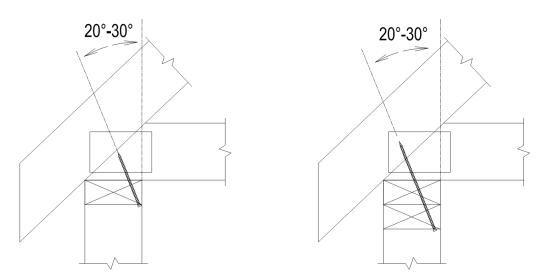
Installation of Fasteners at an Angle in Single and Double Top Plate to Truss/Rafter/Joist Applications
